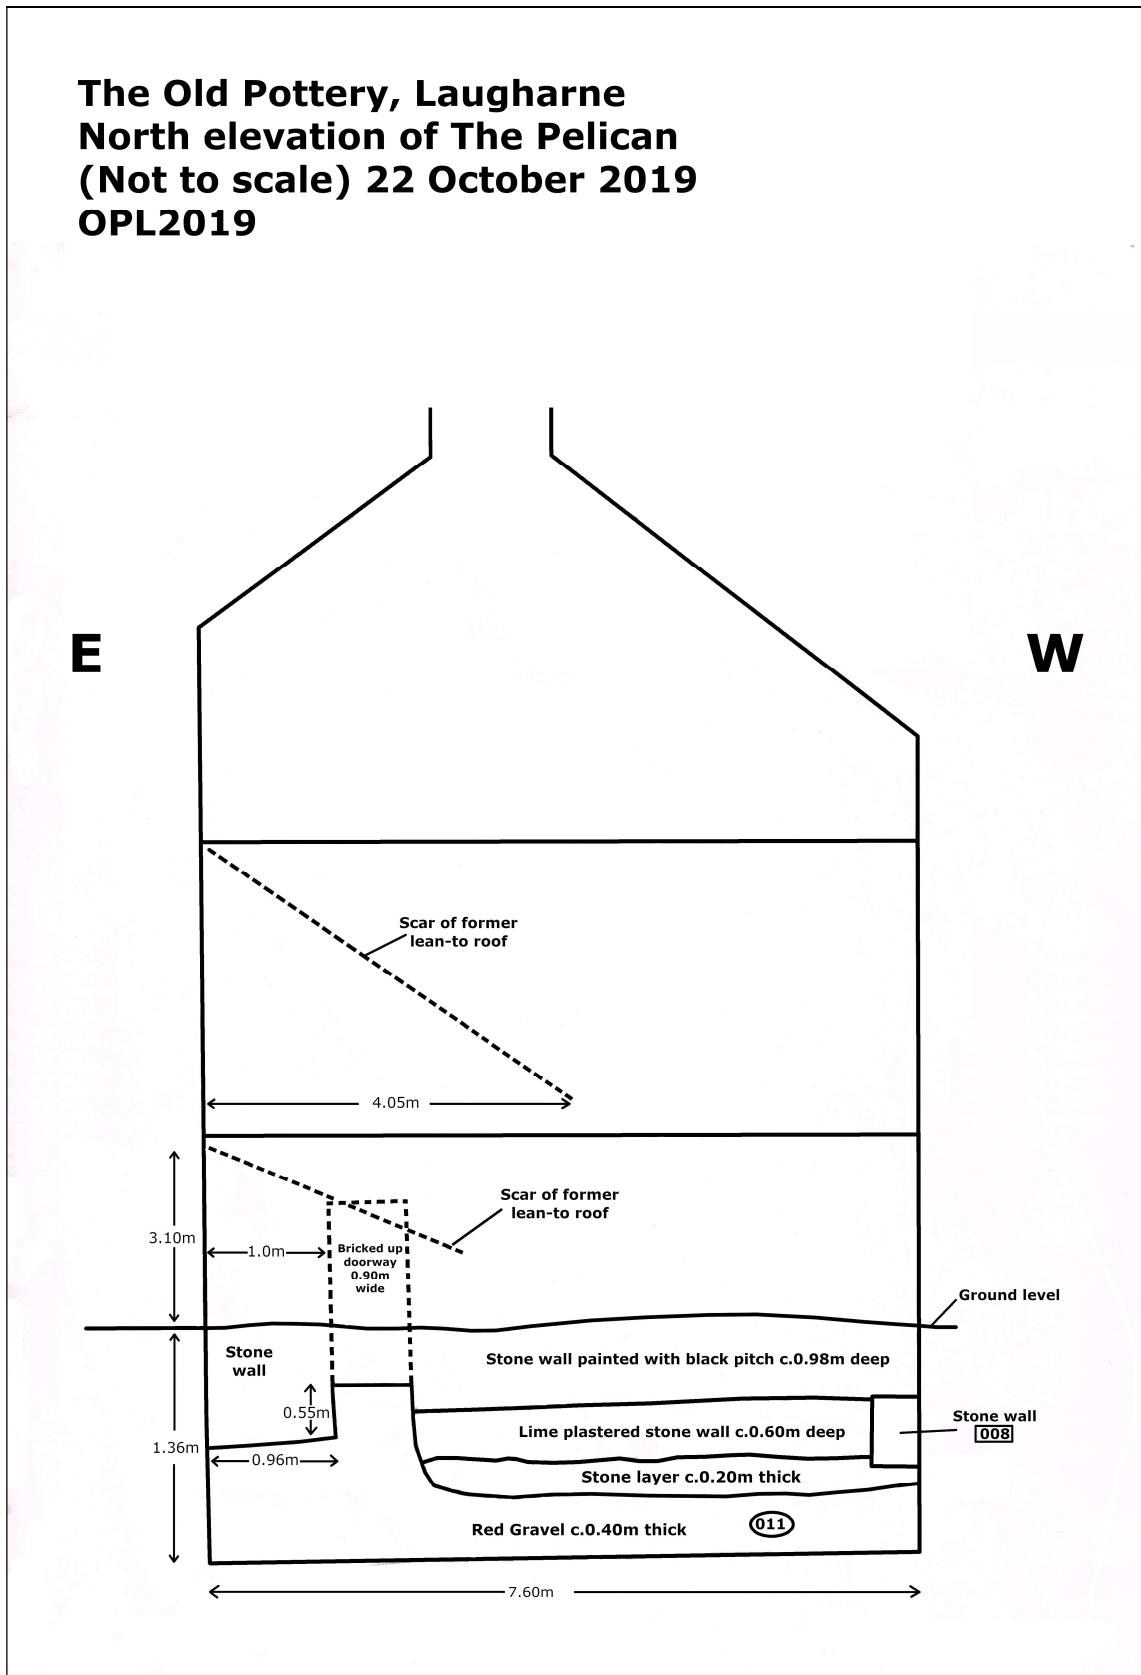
The southern side of Trench A including detail of the north wall of the Pelican.
